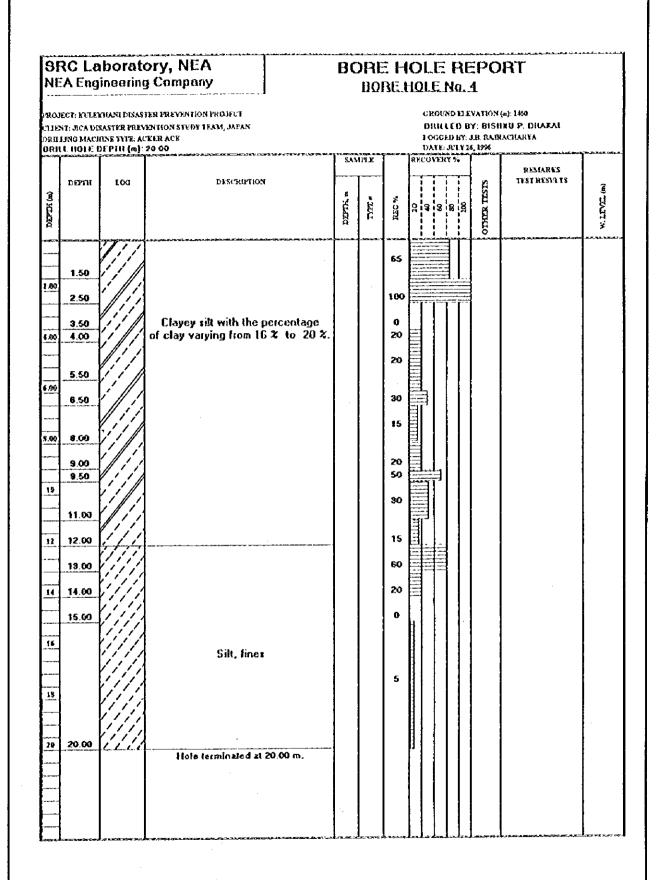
Bore Hole Report (Bore Hole No. 4)
